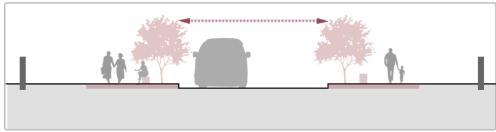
Sidewalks, trees and street furniture define spaces along wide roads (Author 2014)
